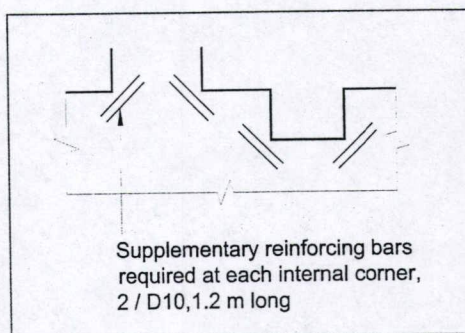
Irregular slab (plan view) (see 7.5.8.6.2)
